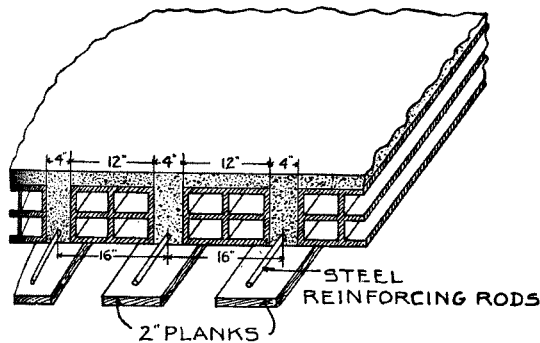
Combination floor system of reinforced concrete and hollow tiles (from Cosgrove, Hollow Tile Construction, 79).
